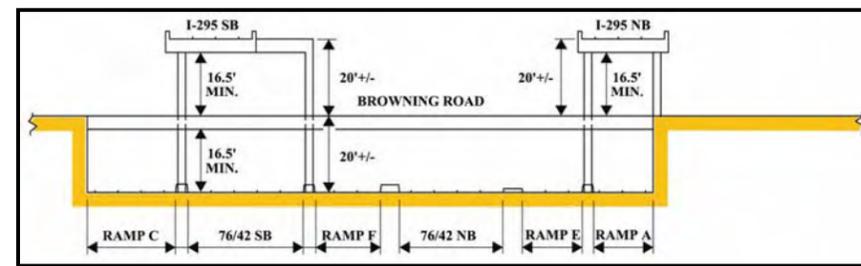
Section A-A at Browning Road (Alternative F1)
